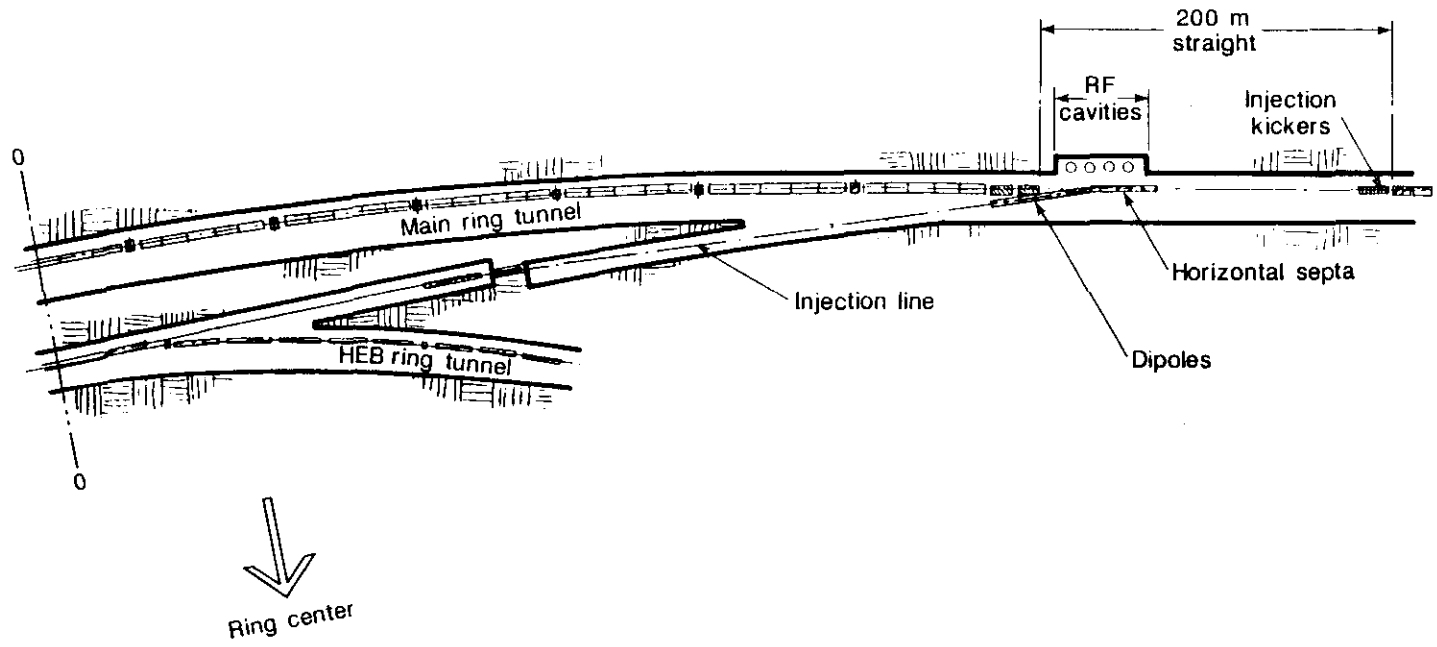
Injection Tunnels from the HEB to the Collider, Plan View.
